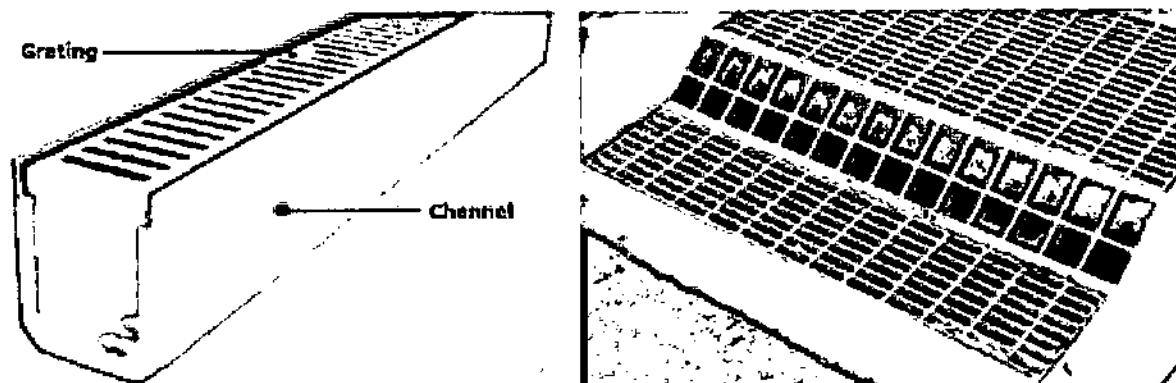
Typical view of the proposed rectangular drain and lateral collection points/drains
